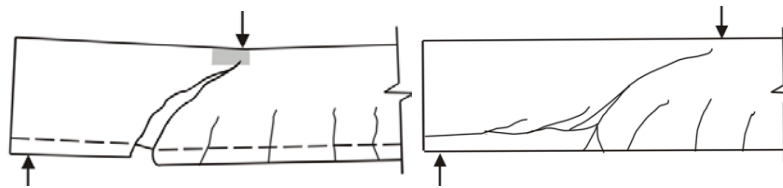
Failure types for $1 < a/d < 2.5$: a) shear compression failure, b) shear tension failure (ASCE-ACI 426 1973)
